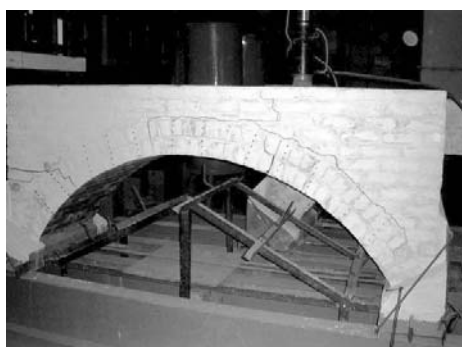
Cracks in the arch barrel and the spandrel wall in AF1 arch.
